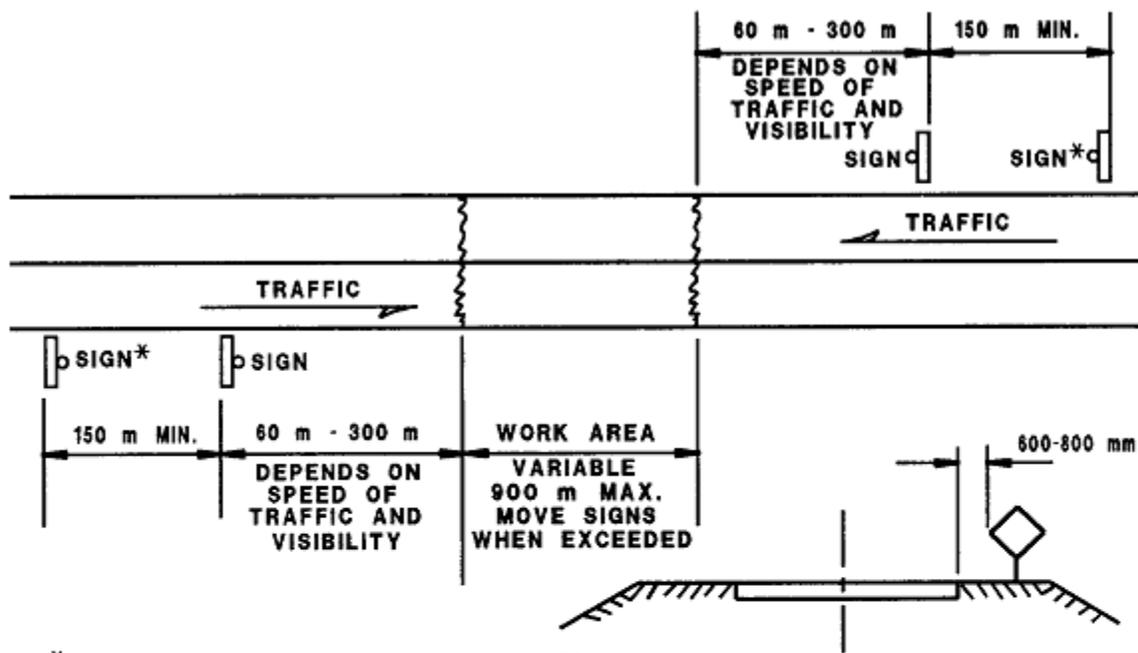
Typical Sign Placement for Work Area on a Single Roadway
